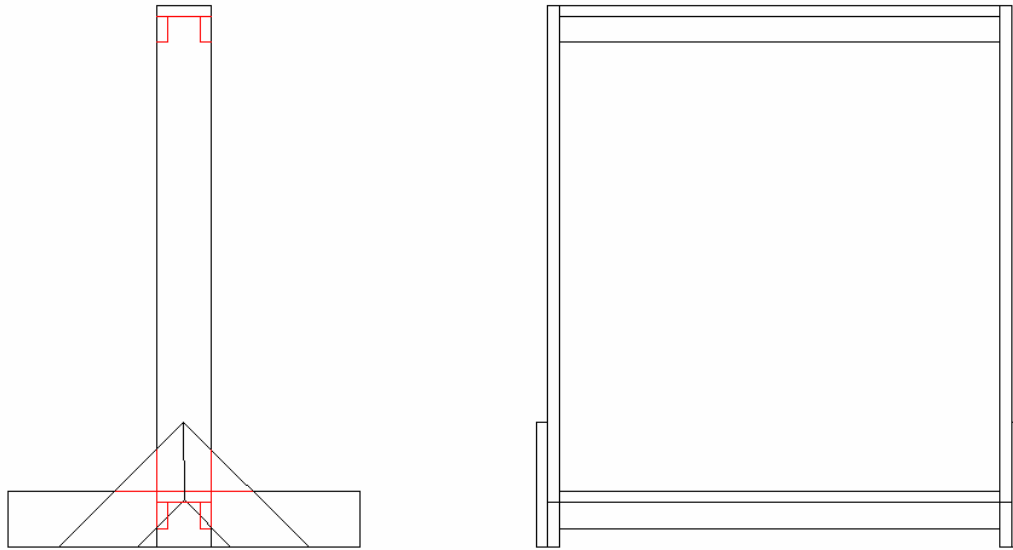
Side and front view drawing of abutments for the test bridge.
